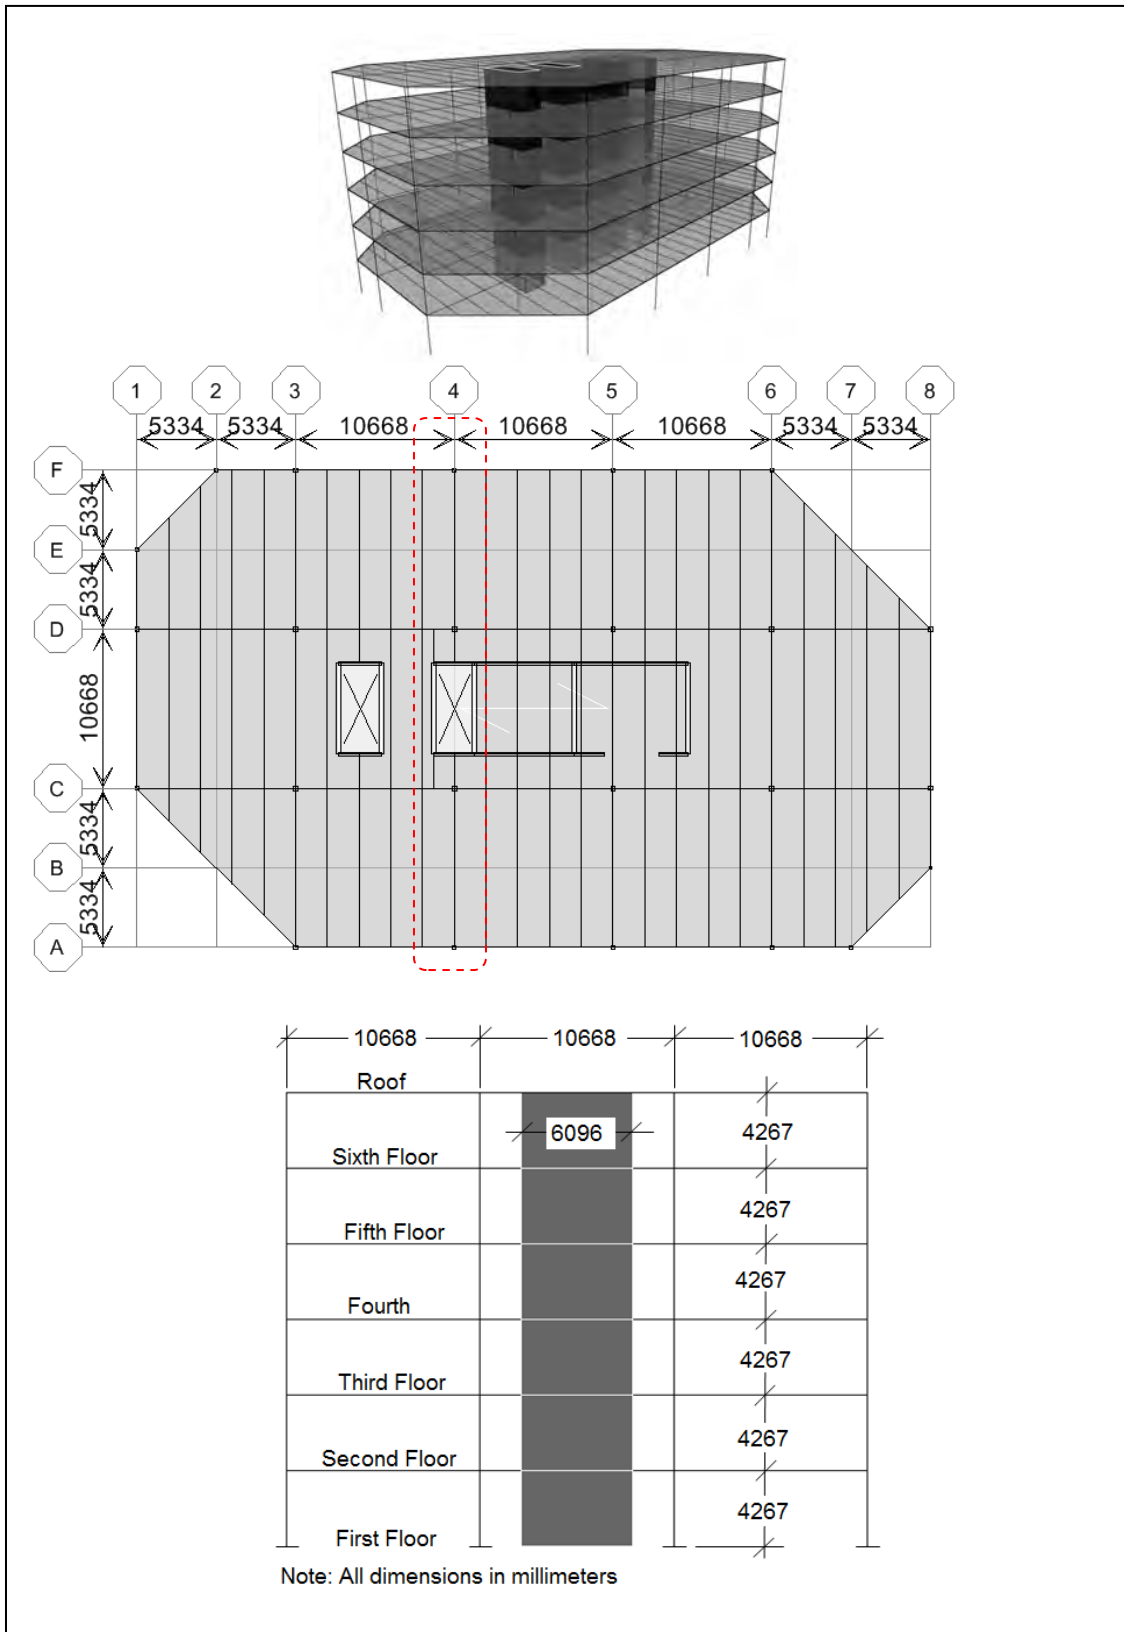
Building SW-1 3D, Plan and Section at Gridline 4
